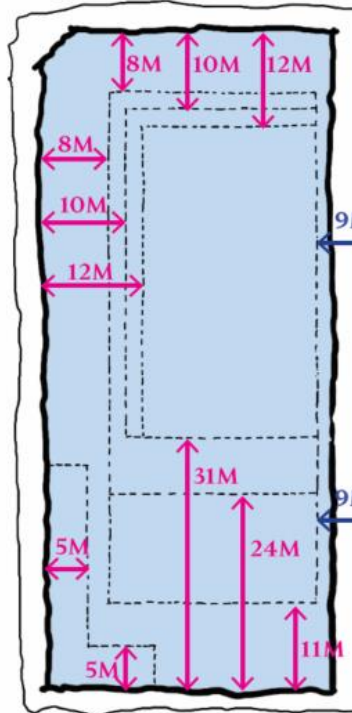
Upper level setbacks of Building A. Source: Development Plan (Gurner 2023)
